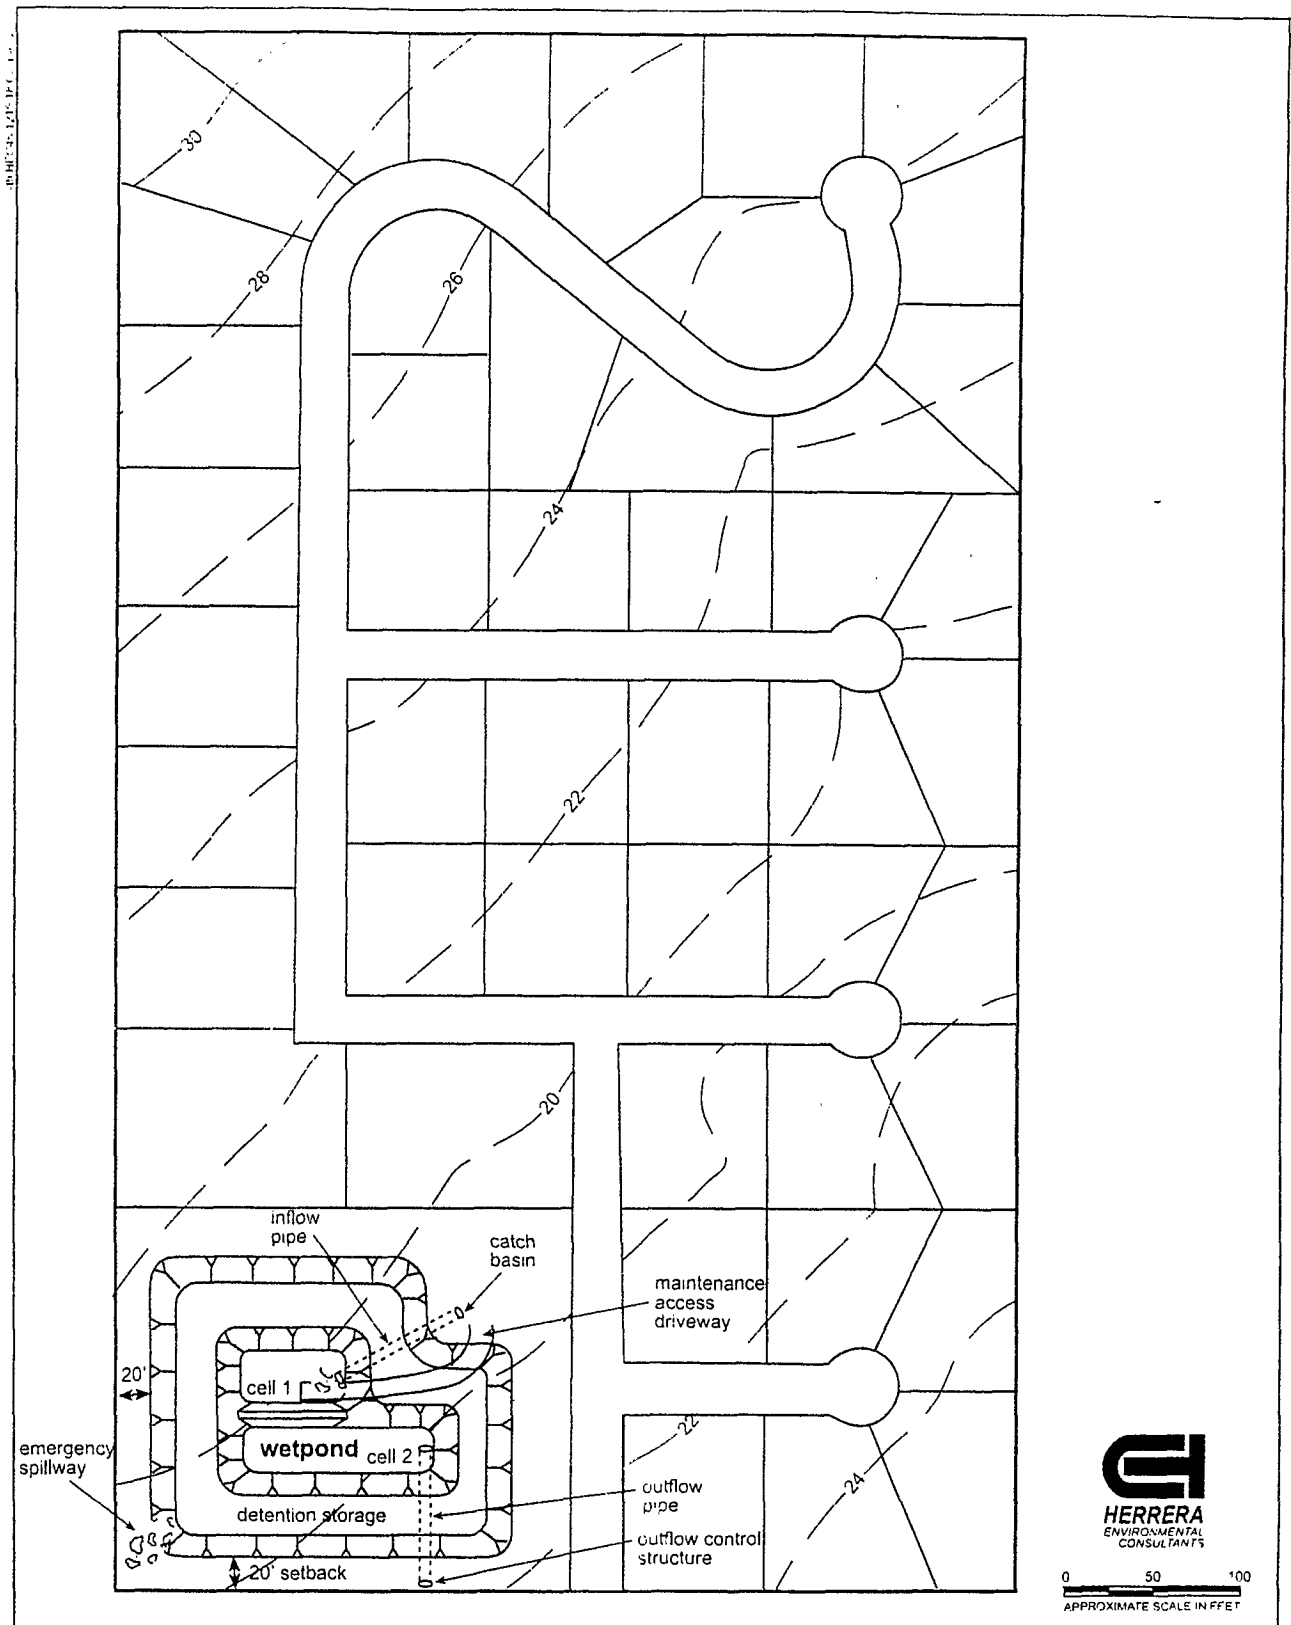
Permanent stormwater site plan BMPs for 10-acre residential development without infiltration.
